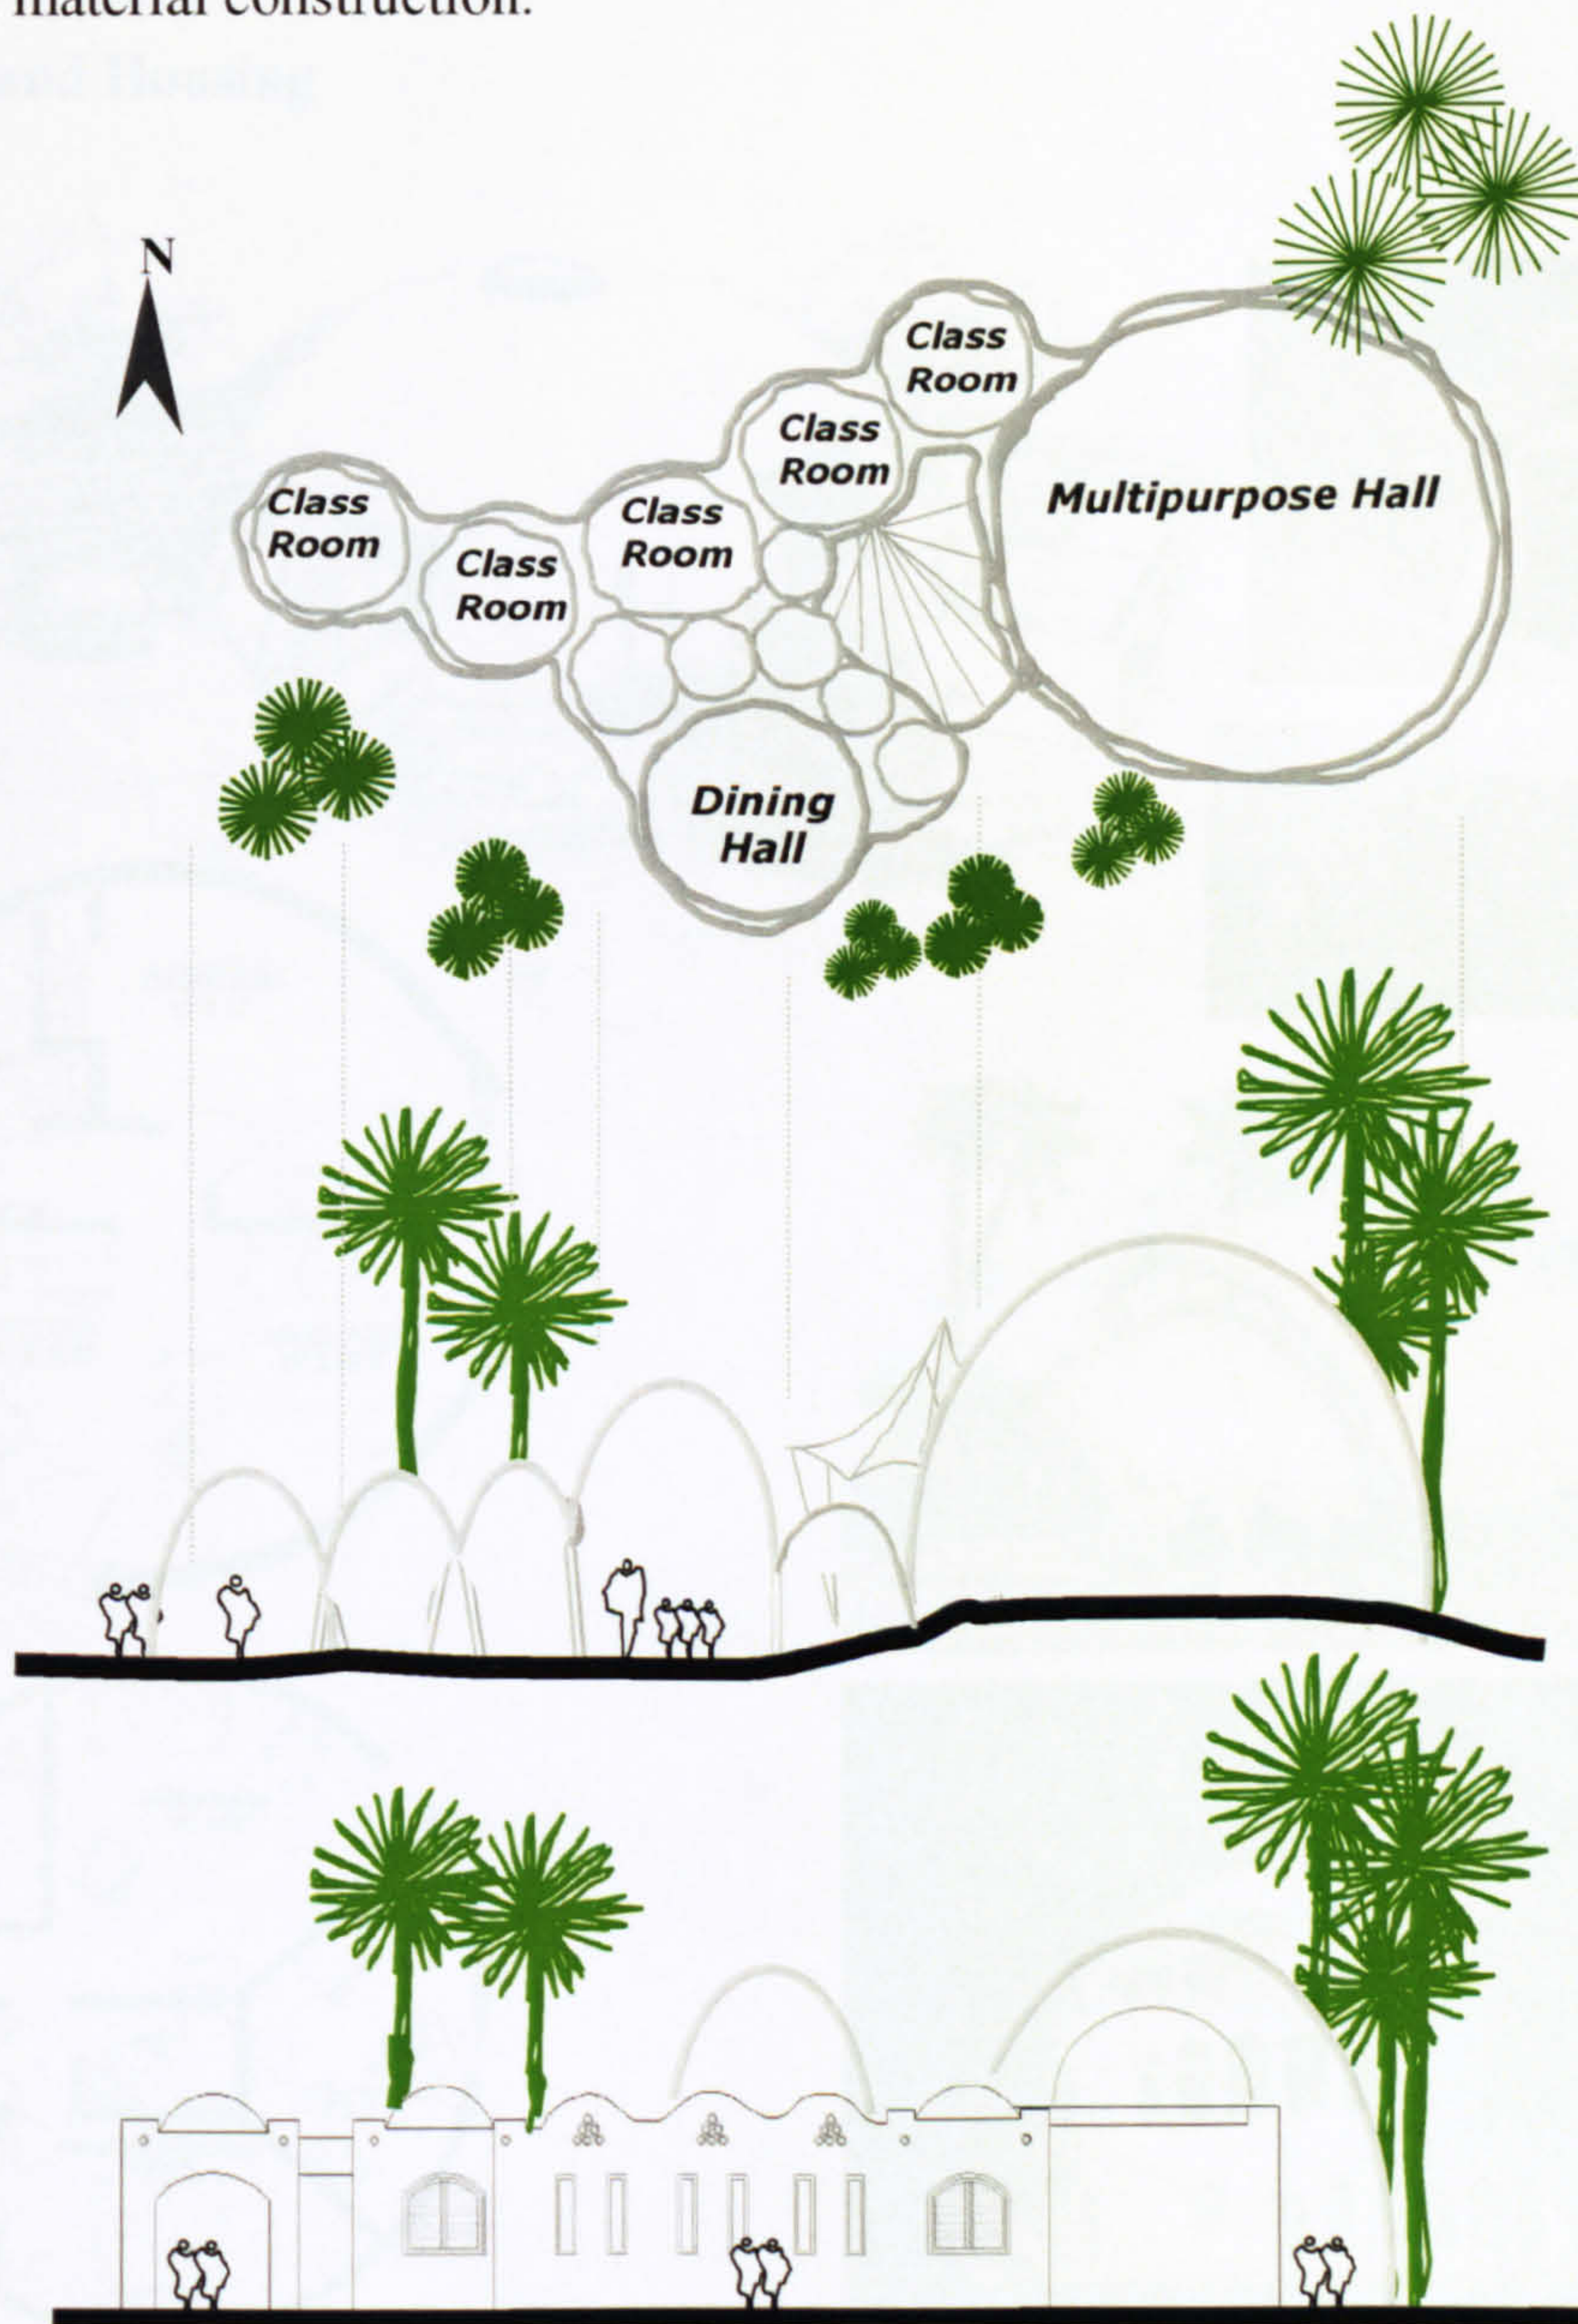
Plan, Section and Elevation of an Architectural Proposal for a Nursery, Primary School, or Multicultural Community Centre
